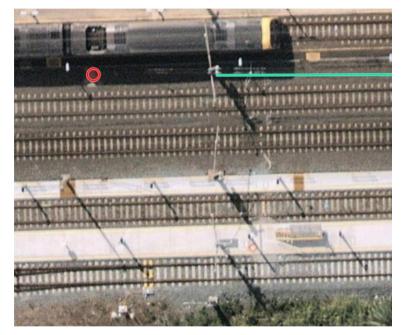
Guy anchor footing SW83+603 - City end of the works (Source: Marsupial Lion, provided 28 June 2022)
